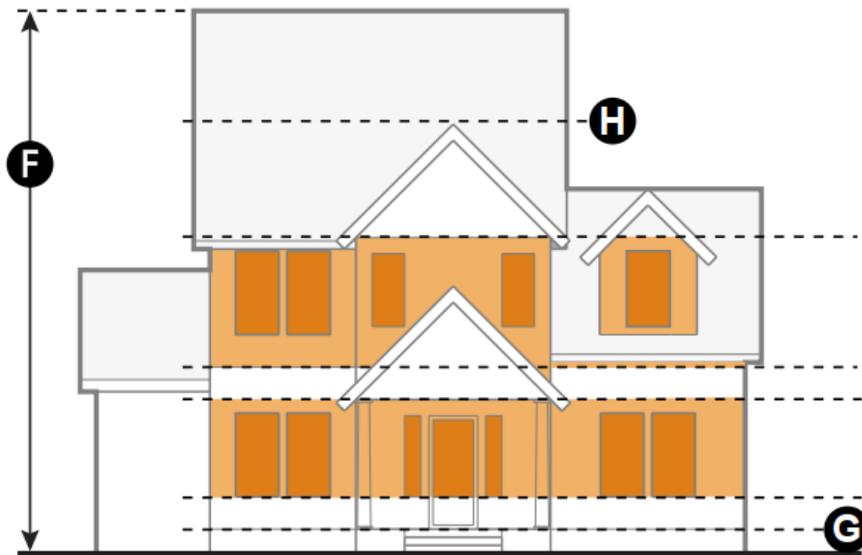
Neighborhood General Single-Family Principal Building Placement.
